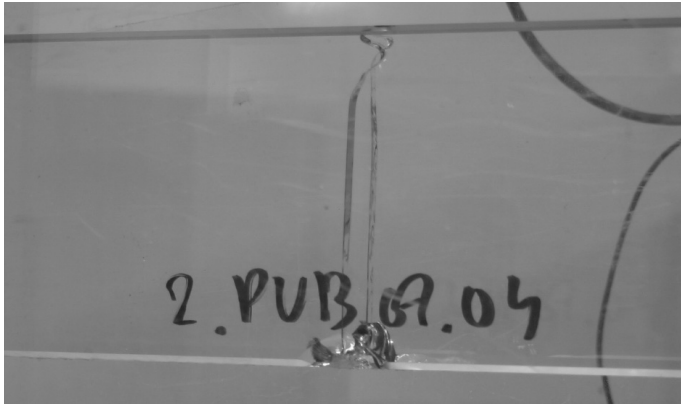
Fracture pattern at initial failure in a double layer annealed glass beam tested in 4-point bending, with full predamage (level II = III).
